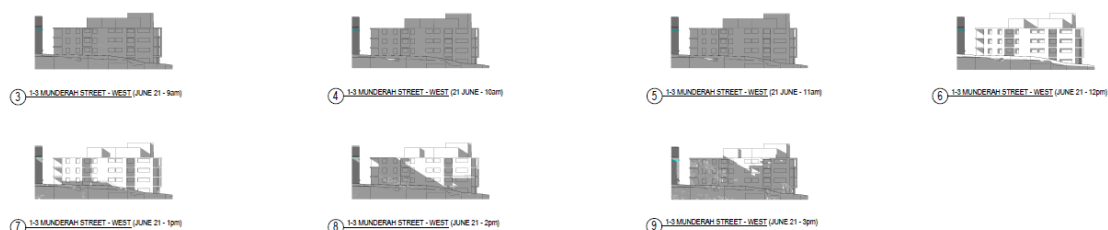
Proposed solar impacts 21 June on 1-3 Munderah Street (West)
